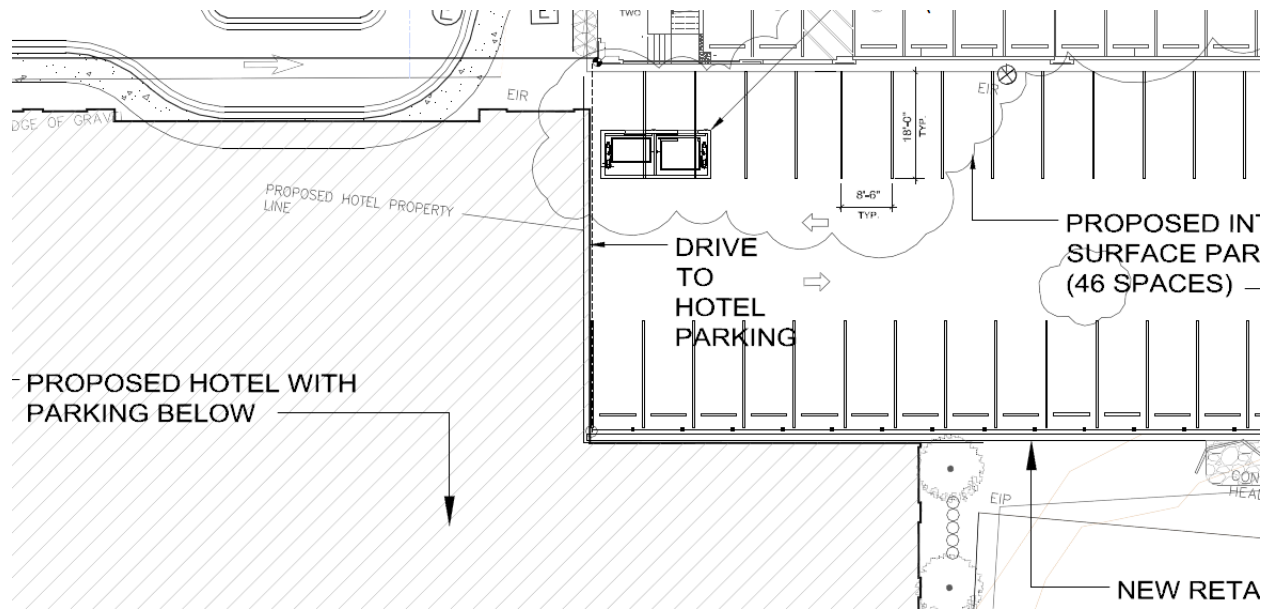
Plan showing proposed parking deck expansion and access to underground hotel parking
